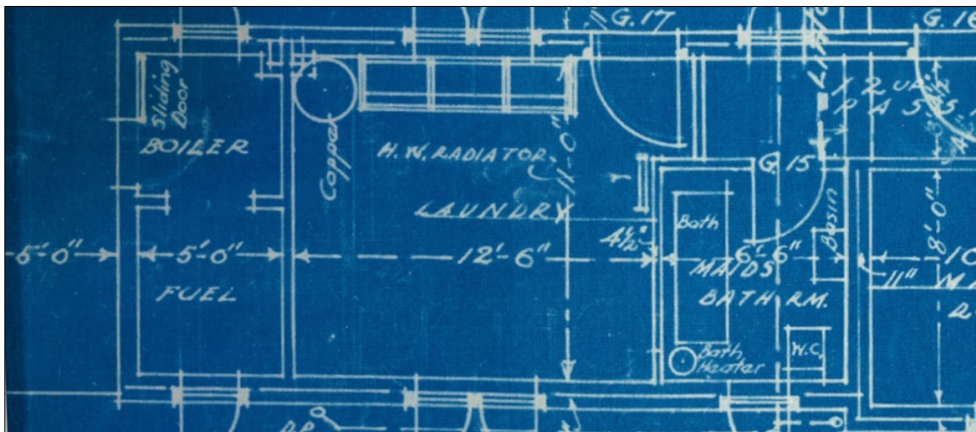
Extract from the 1926 ground floor plan showing the original service wing.
